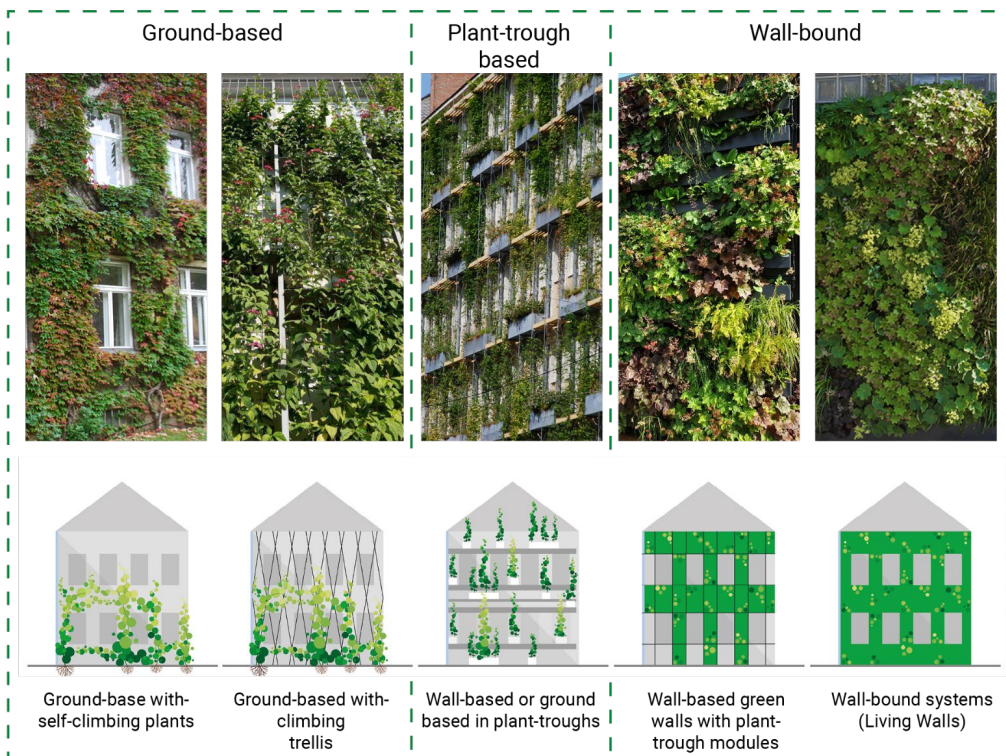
Greening solutions for façade greening of buildings (© GRÜNSTATTGRAU)
